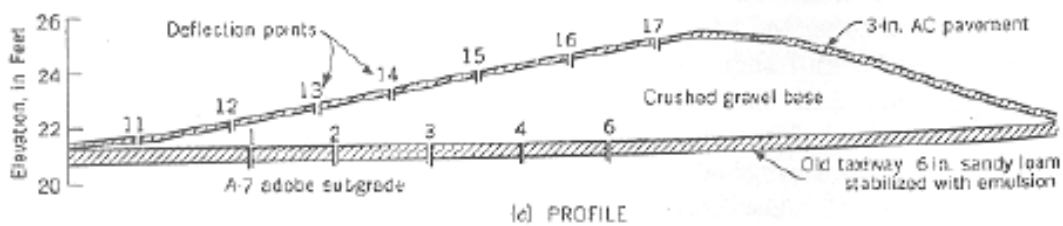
STOCKTON RUNWAY TEST SECTION
